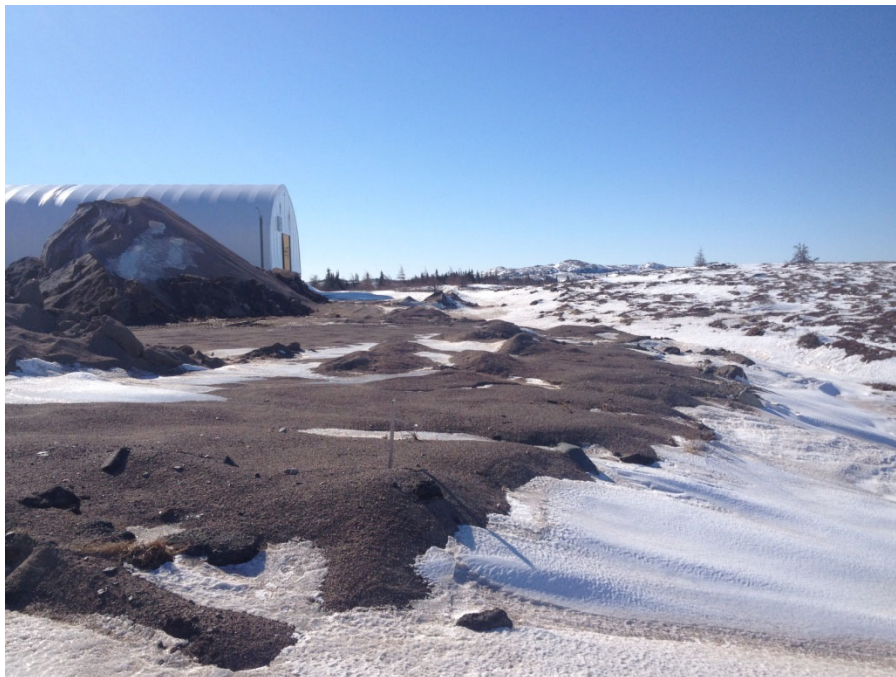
showing west end of DWT storage building, looking south toward Route 211. New bypass road will be located to right of the DWT depot area.
